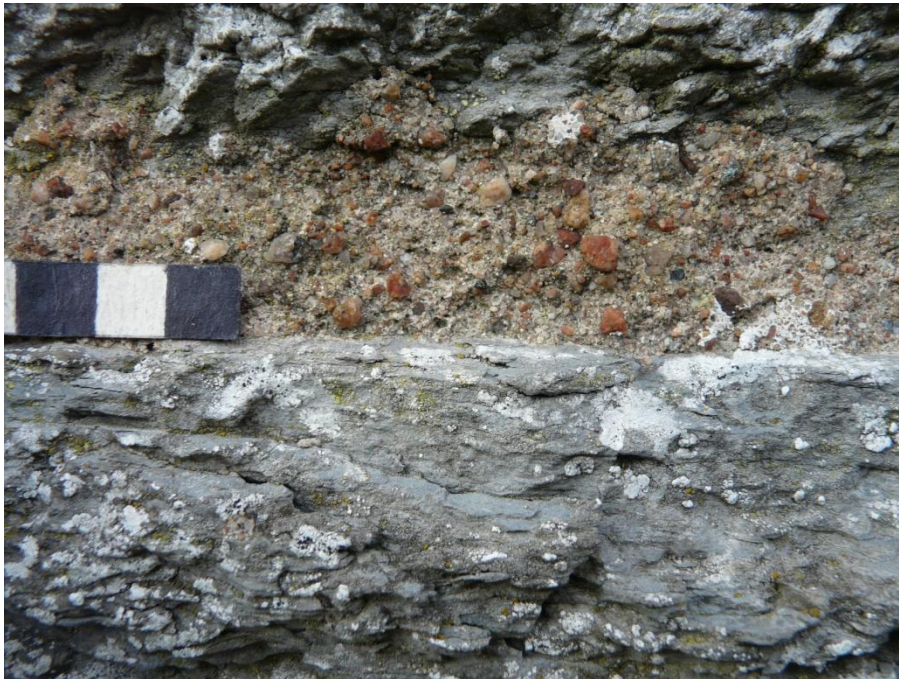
(above) – South aisle; external face of west wall; recessed pointing in cementitious mortar. Scale 10mm; photograph Mark Thacker.
